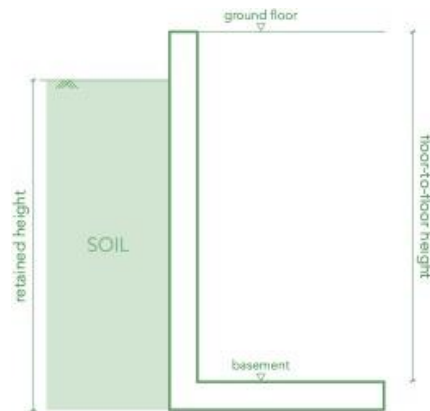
Schematic diagram showing example of retained height and floor-to-floor heights of a typical retaining wall
